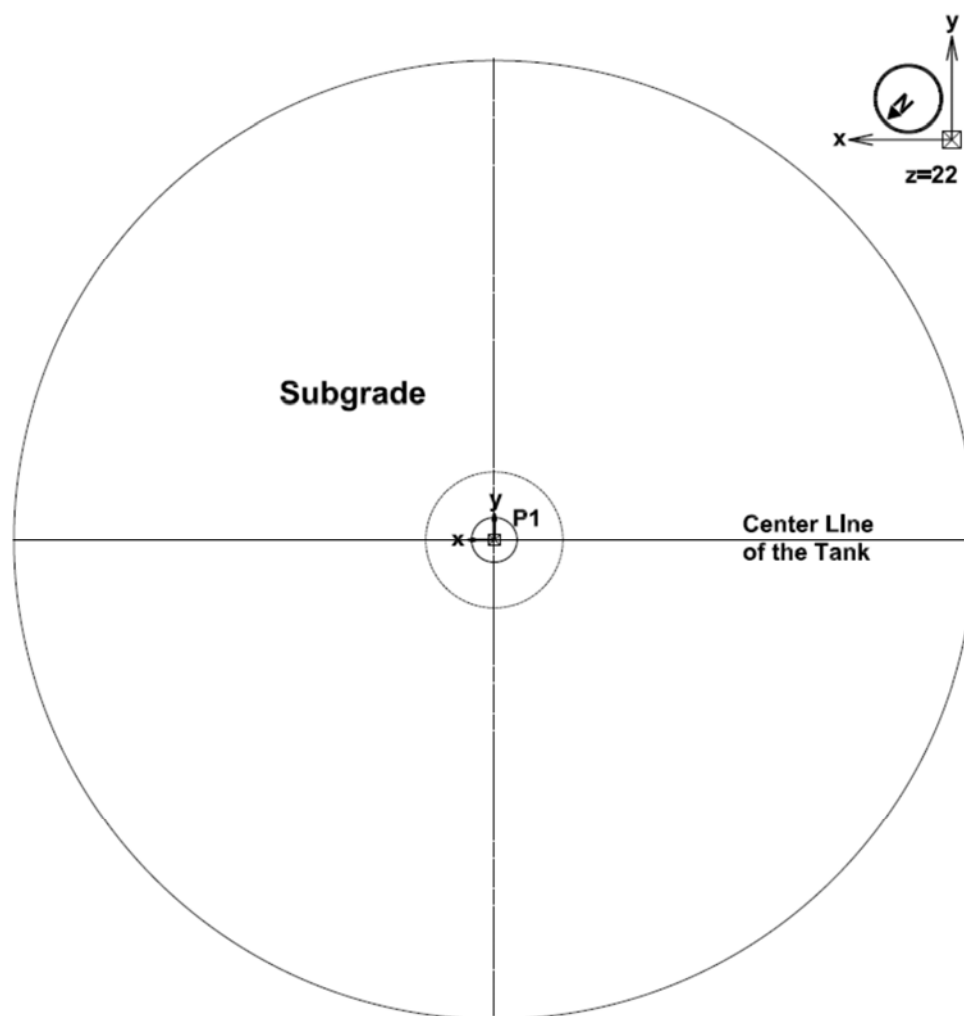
Instrumentation plan for experiment No. 6—Profile view at $Z = 22$ inches
